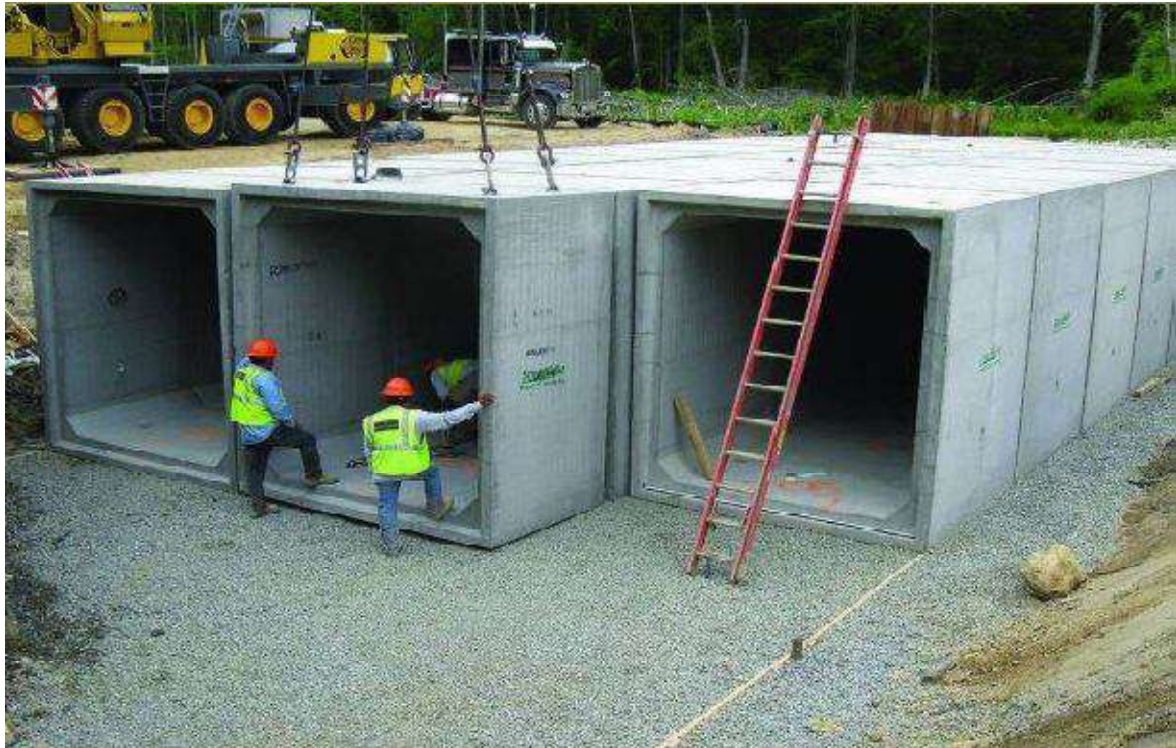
Multiple Concrete Box Culvert (Source: miller-miller-inc.com).
